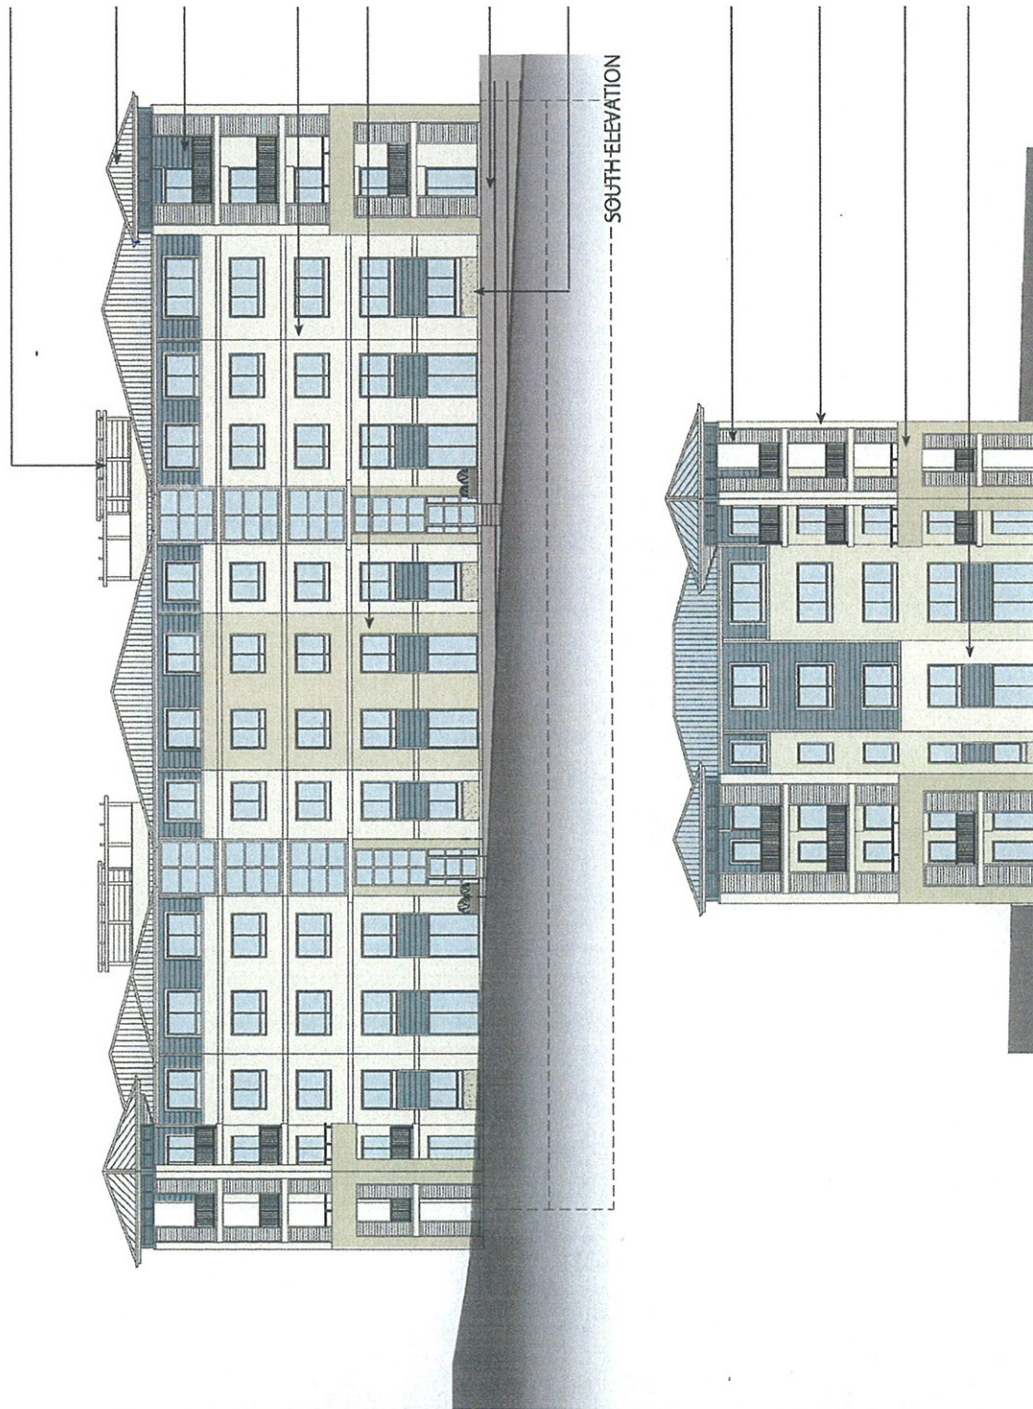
Part elevation from Peninsula Drive (Building 6C1)
